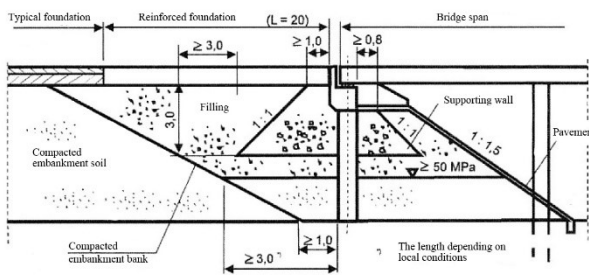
Transitional section of the track in the embankment (French railways). In front of the bridge was used reinforced track foundation along the length of $L = 20$ m [12]
